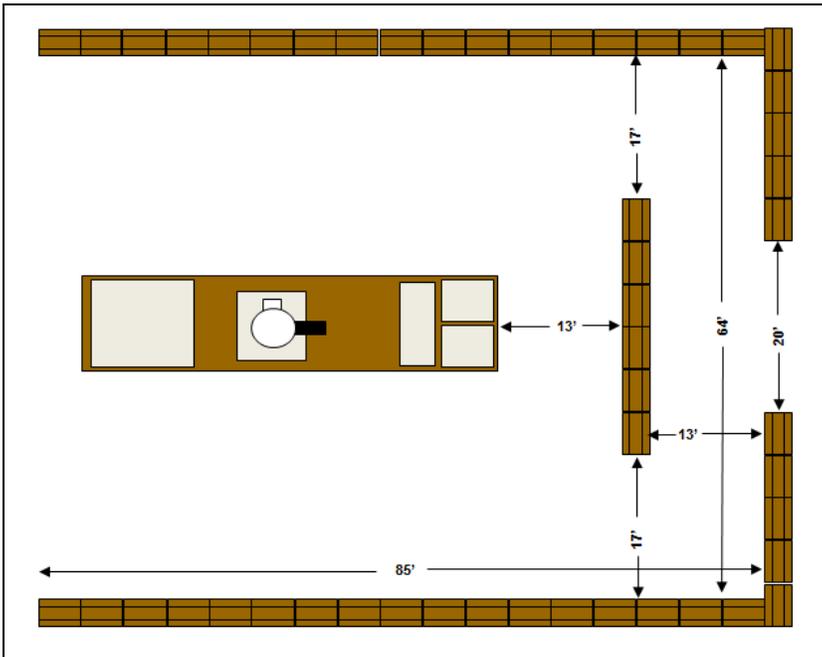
Sample of LPWS site with HESCO Barriers. Short ends of barriers would not be set until LPWS is in place.
